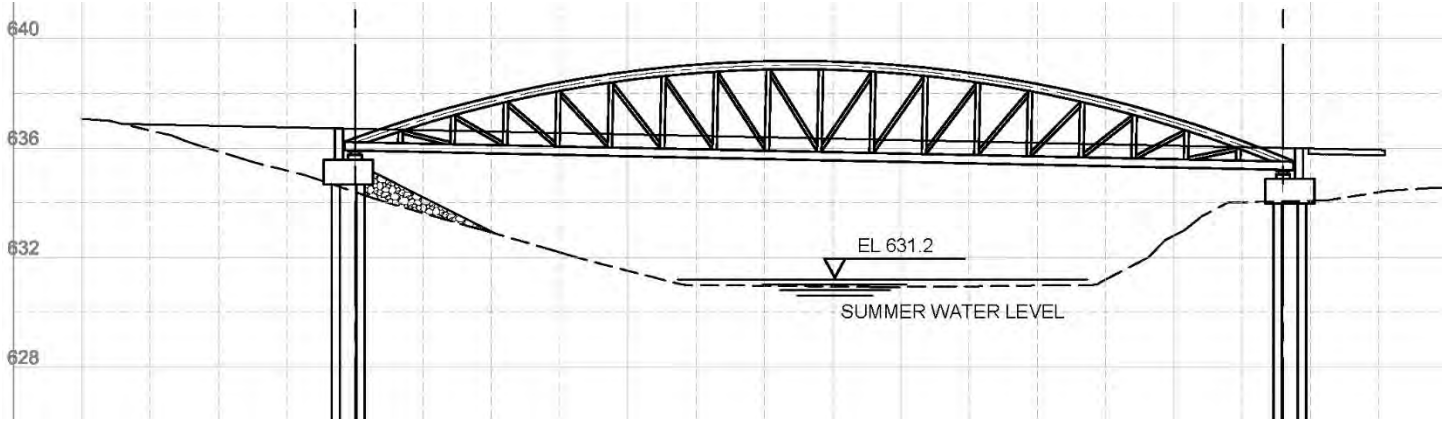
Pedestrian Bridge Plan at Crossing Locations
